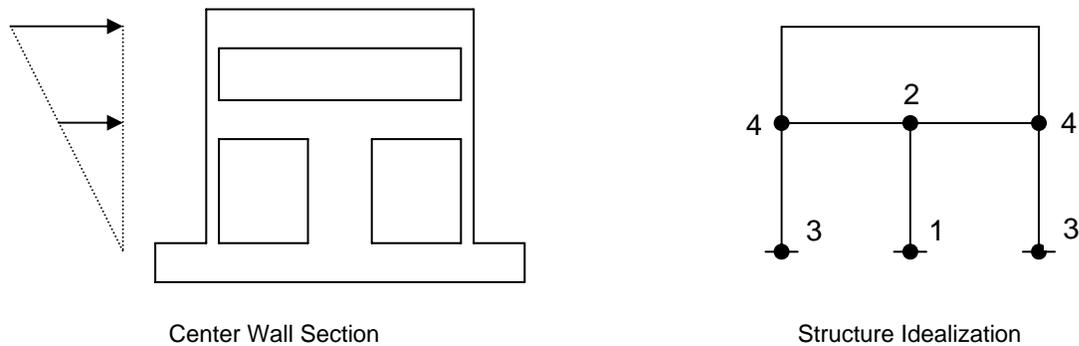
Pushover Model for Navigation Lock Center Wall
